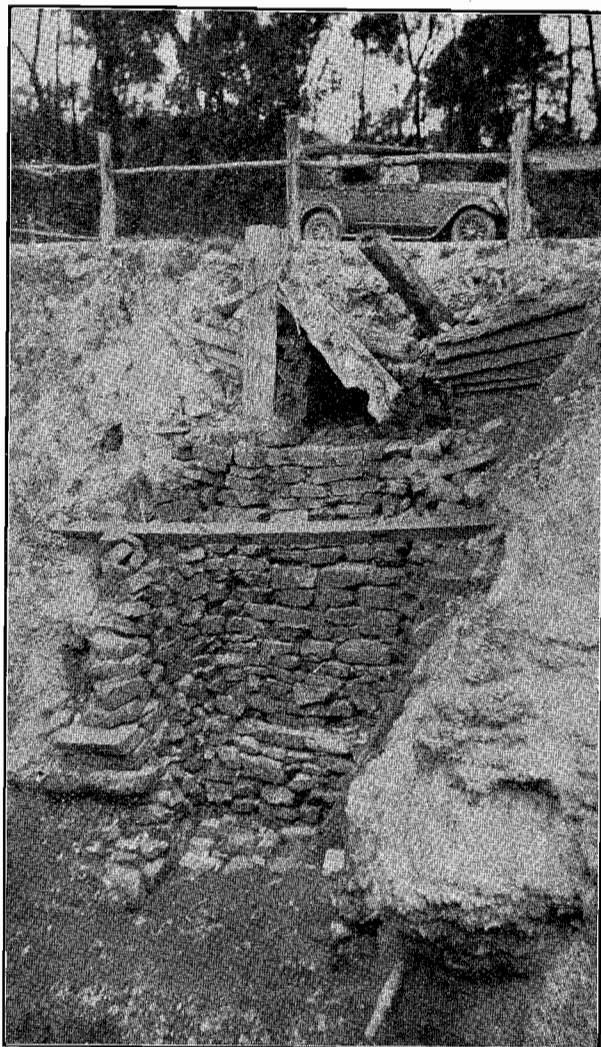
Calder Highway, Section 1, near Elphinstone.
